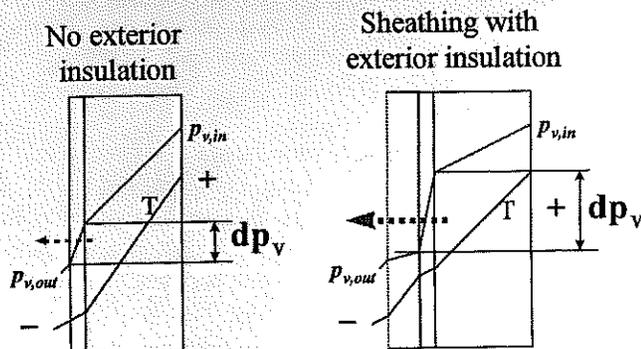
The effect of exterior insulation on the drying potential of a wall.
